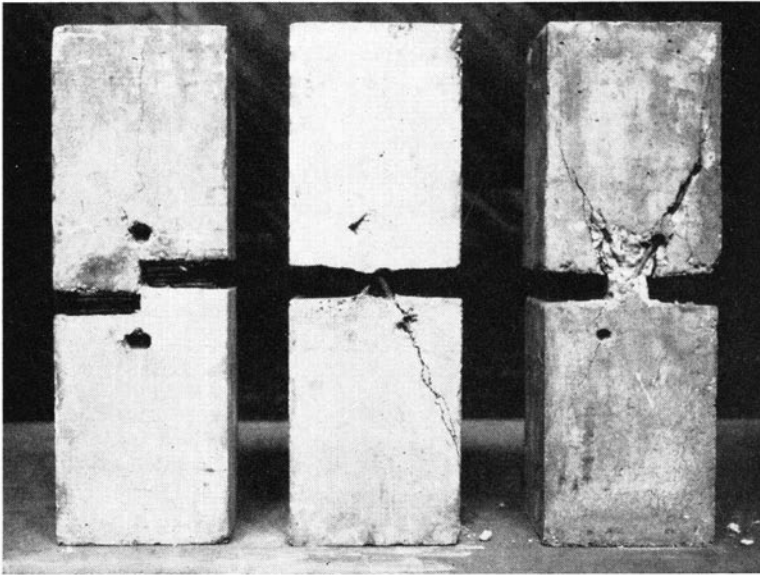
(b) HINGE SPECIMENS AFTER TESTS TO FAILURE
